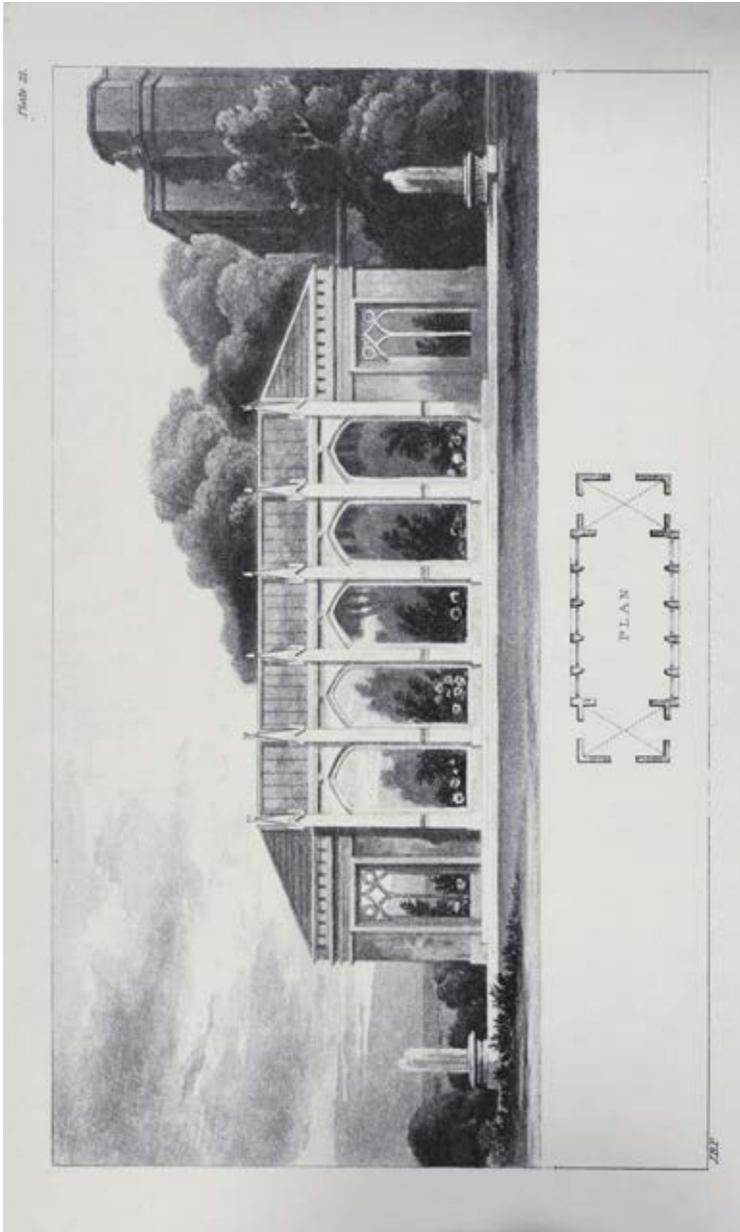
Papworth's plan and elevation for a Gothic conservatory in *Rural Residences* (1818), Plate XXI. Source: Historic England.
